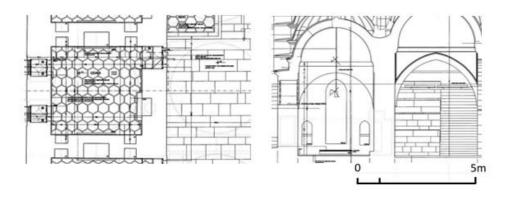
Room detail, plan (left) and section (right) from restoration detail projects by Ayşe Orbay, 2003 (archive of KVKBK 1)
